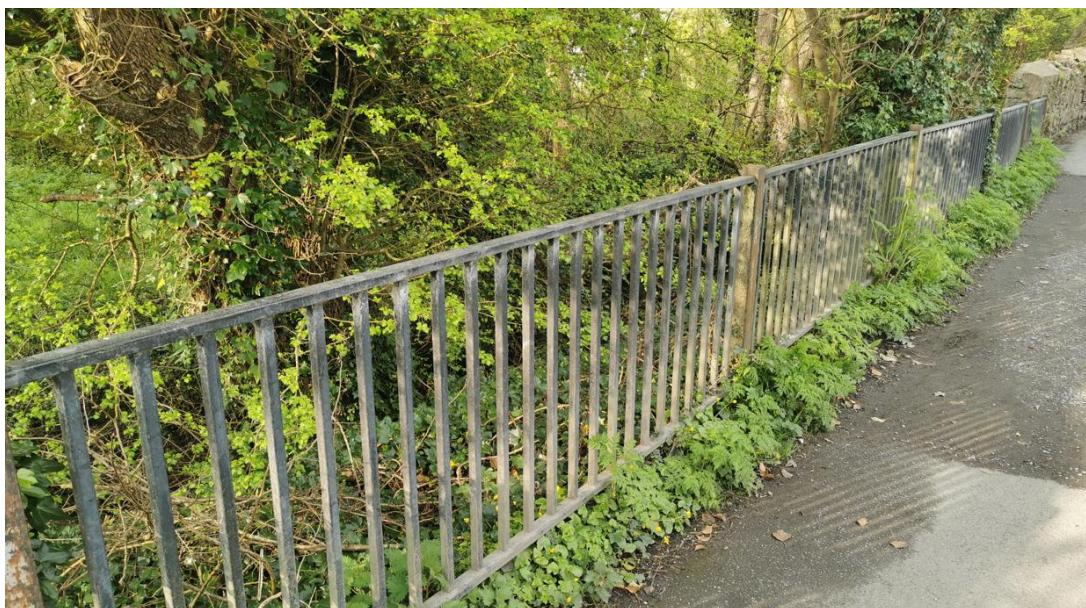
Existing railing between Bridge 2 and Bridge 3
